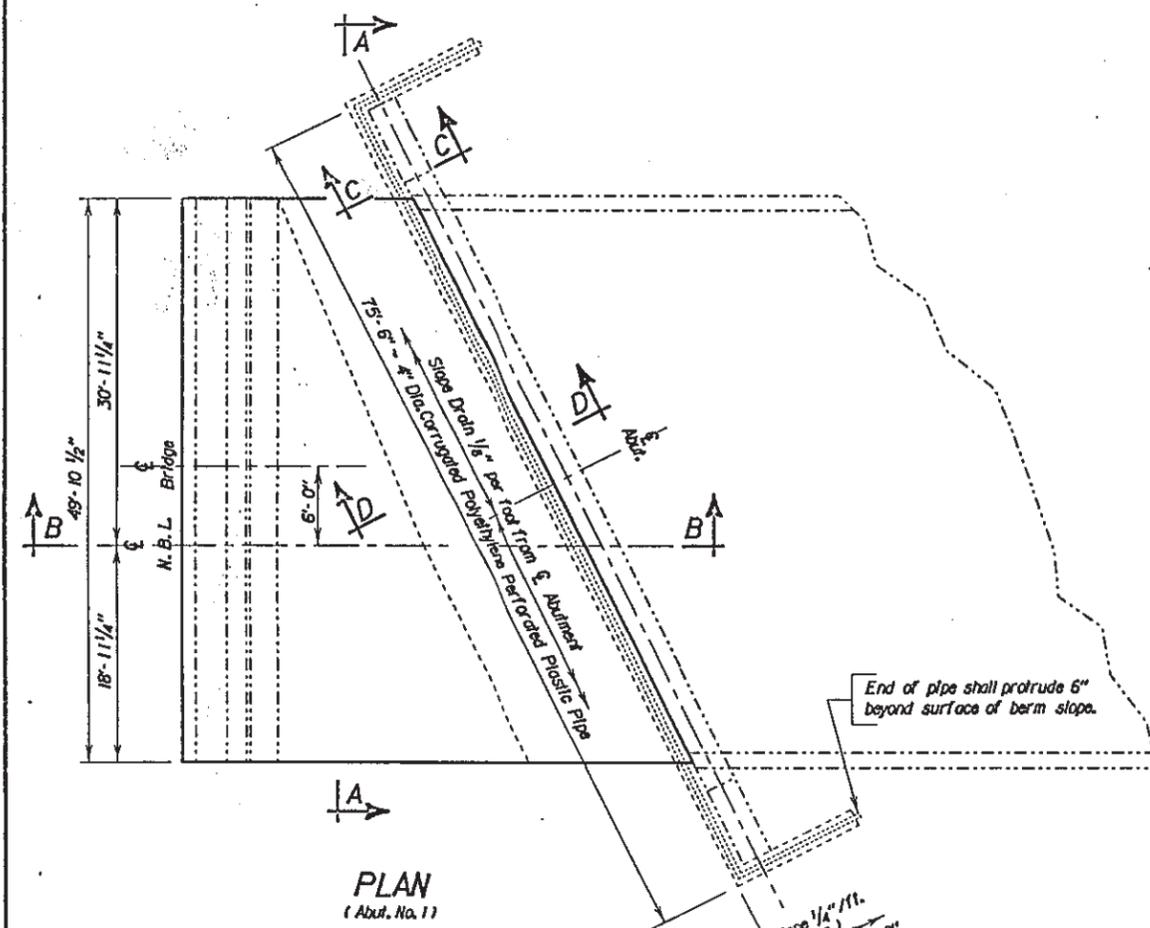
DETAILS OF APPROACH SLAB ADJACENT TO BRIDGE FOR NORTHBOUND LANES
